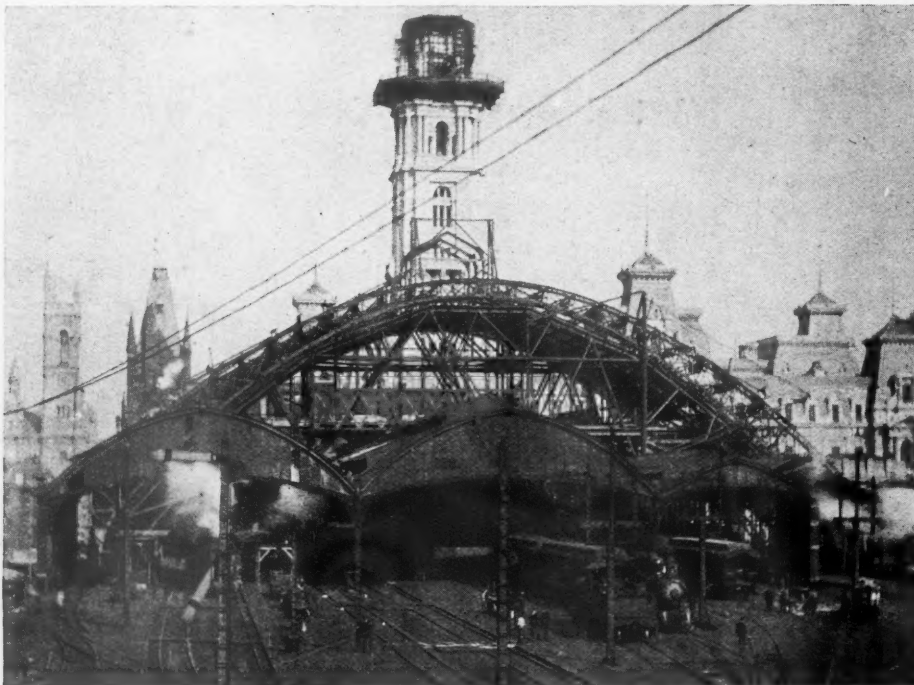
East from Signal Tower at Seventeenth Street. April 18.
